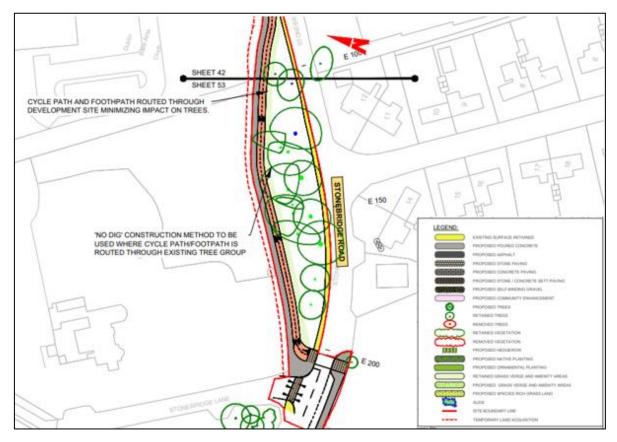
Extract from Landscaping General Arrangement Drawings at Stonebridge Wood (Sheet 53)
